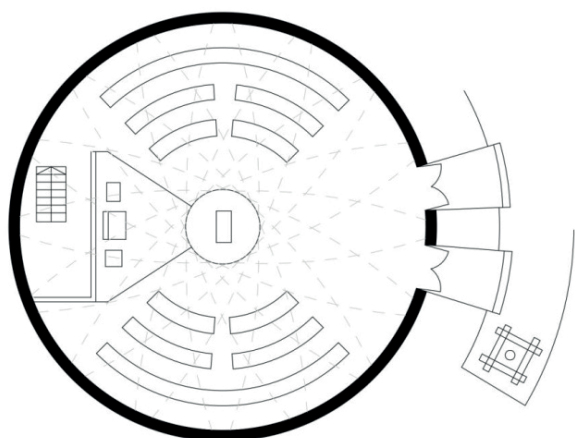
Halásztelek: floor plan of the Church of Saint Elisabeth (1982).
